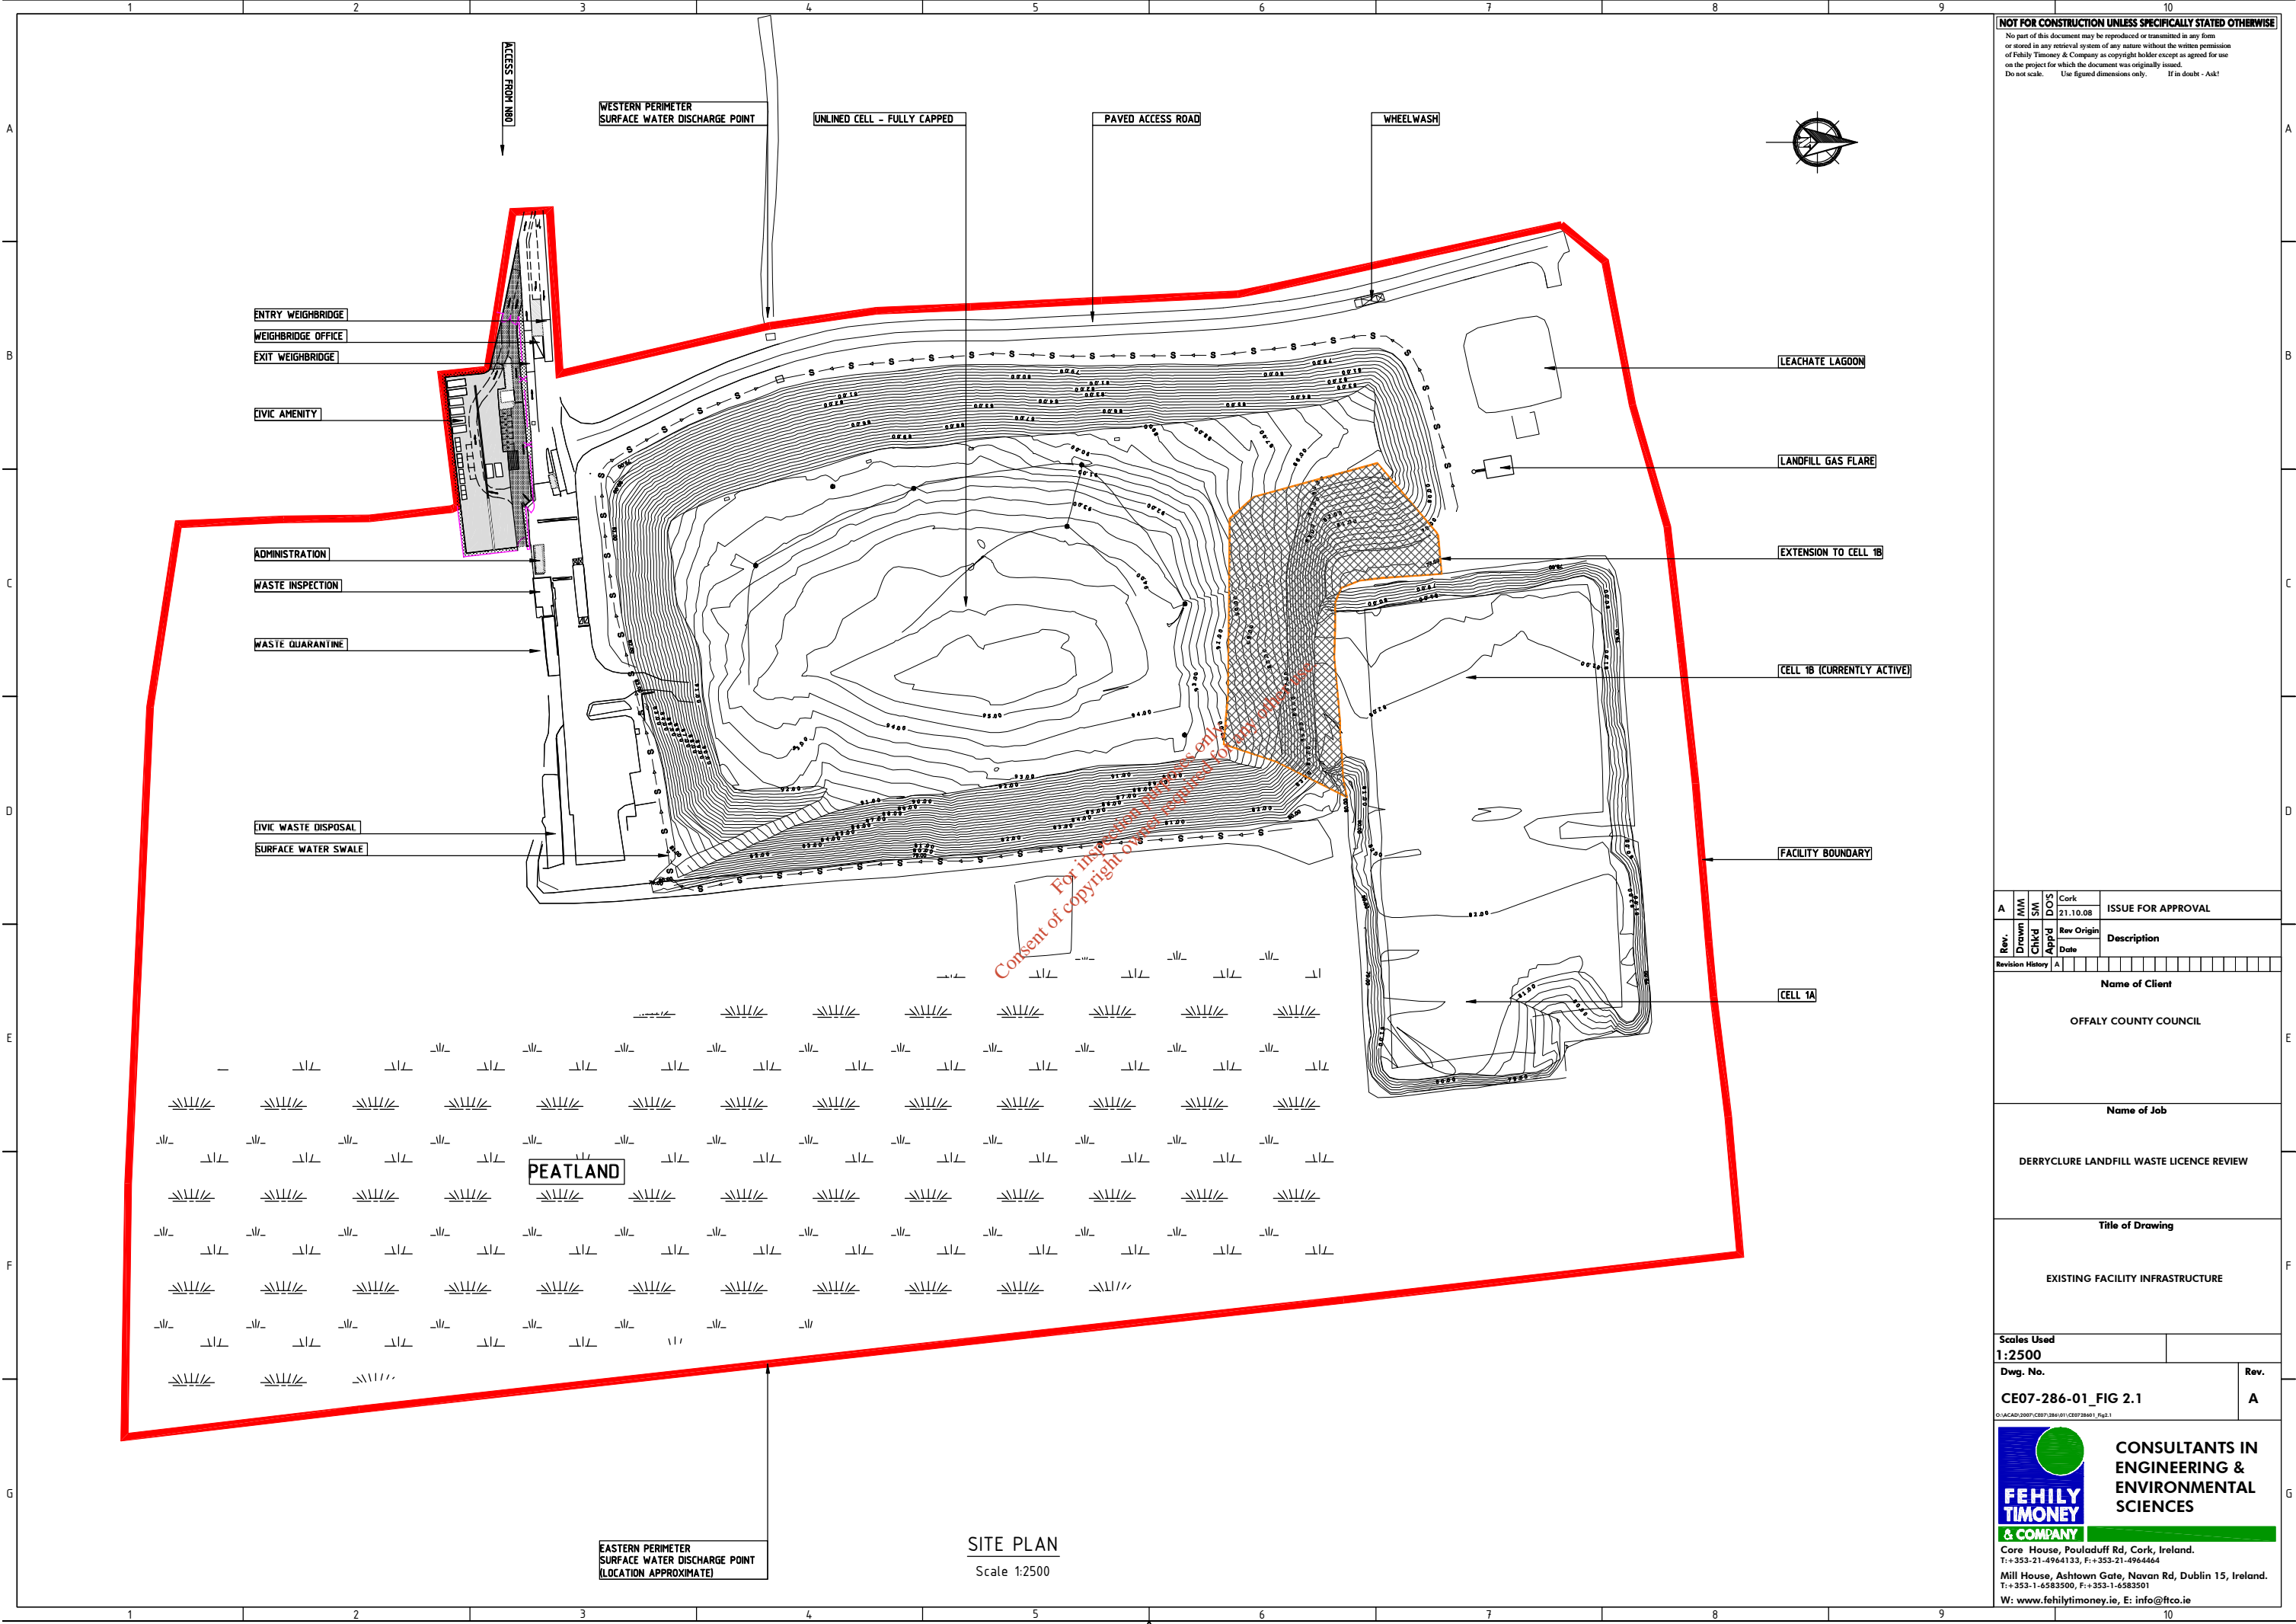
shows the layout of existing facility infrastructure. Figure 2.3 shows the layout of future infrastructure, once the facility has been developed to the extent permitted under its current waste licence.
